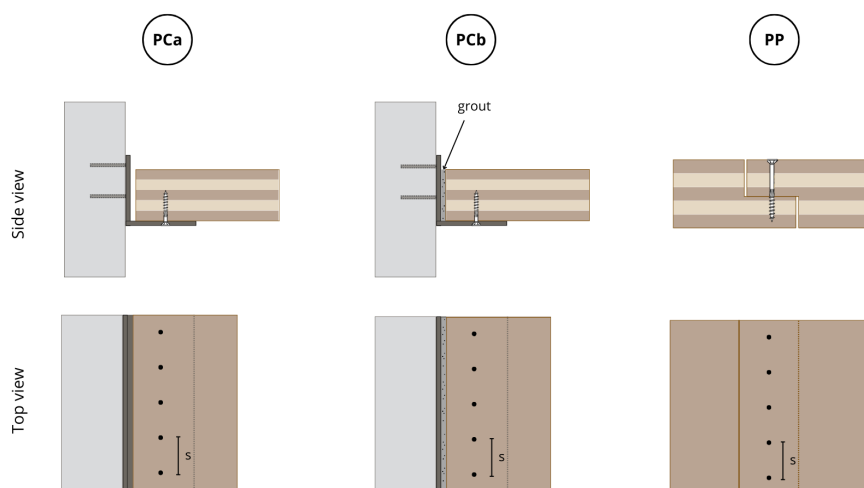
Connection layout for panel–core (PCa), panel–core + grout (PCb) and panel–panel (PP) connection types.
